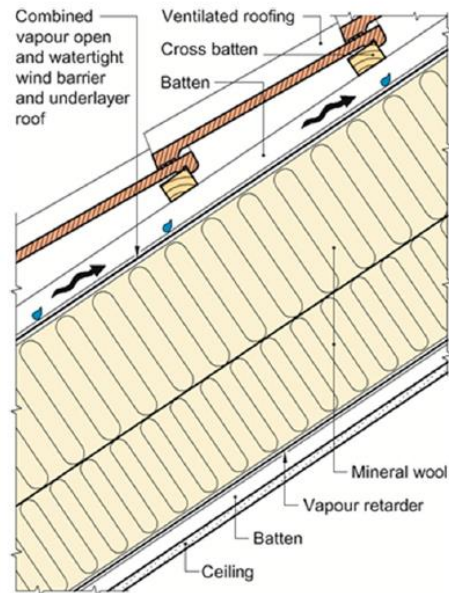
Side section of a sloped ventilated roof structure [64,65].
